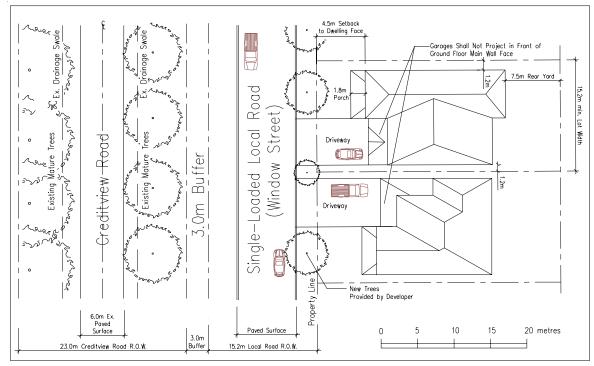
Creditview Road Concept Plan (Direct Frontage)
